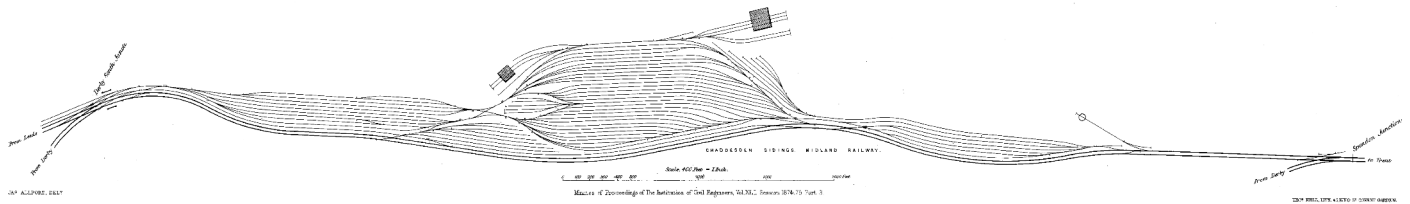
Plan of Chaddesden Sidings presented to the Institute of Civil Engineers in 1875. Enlarge the browser image to view the plan in more detail.
